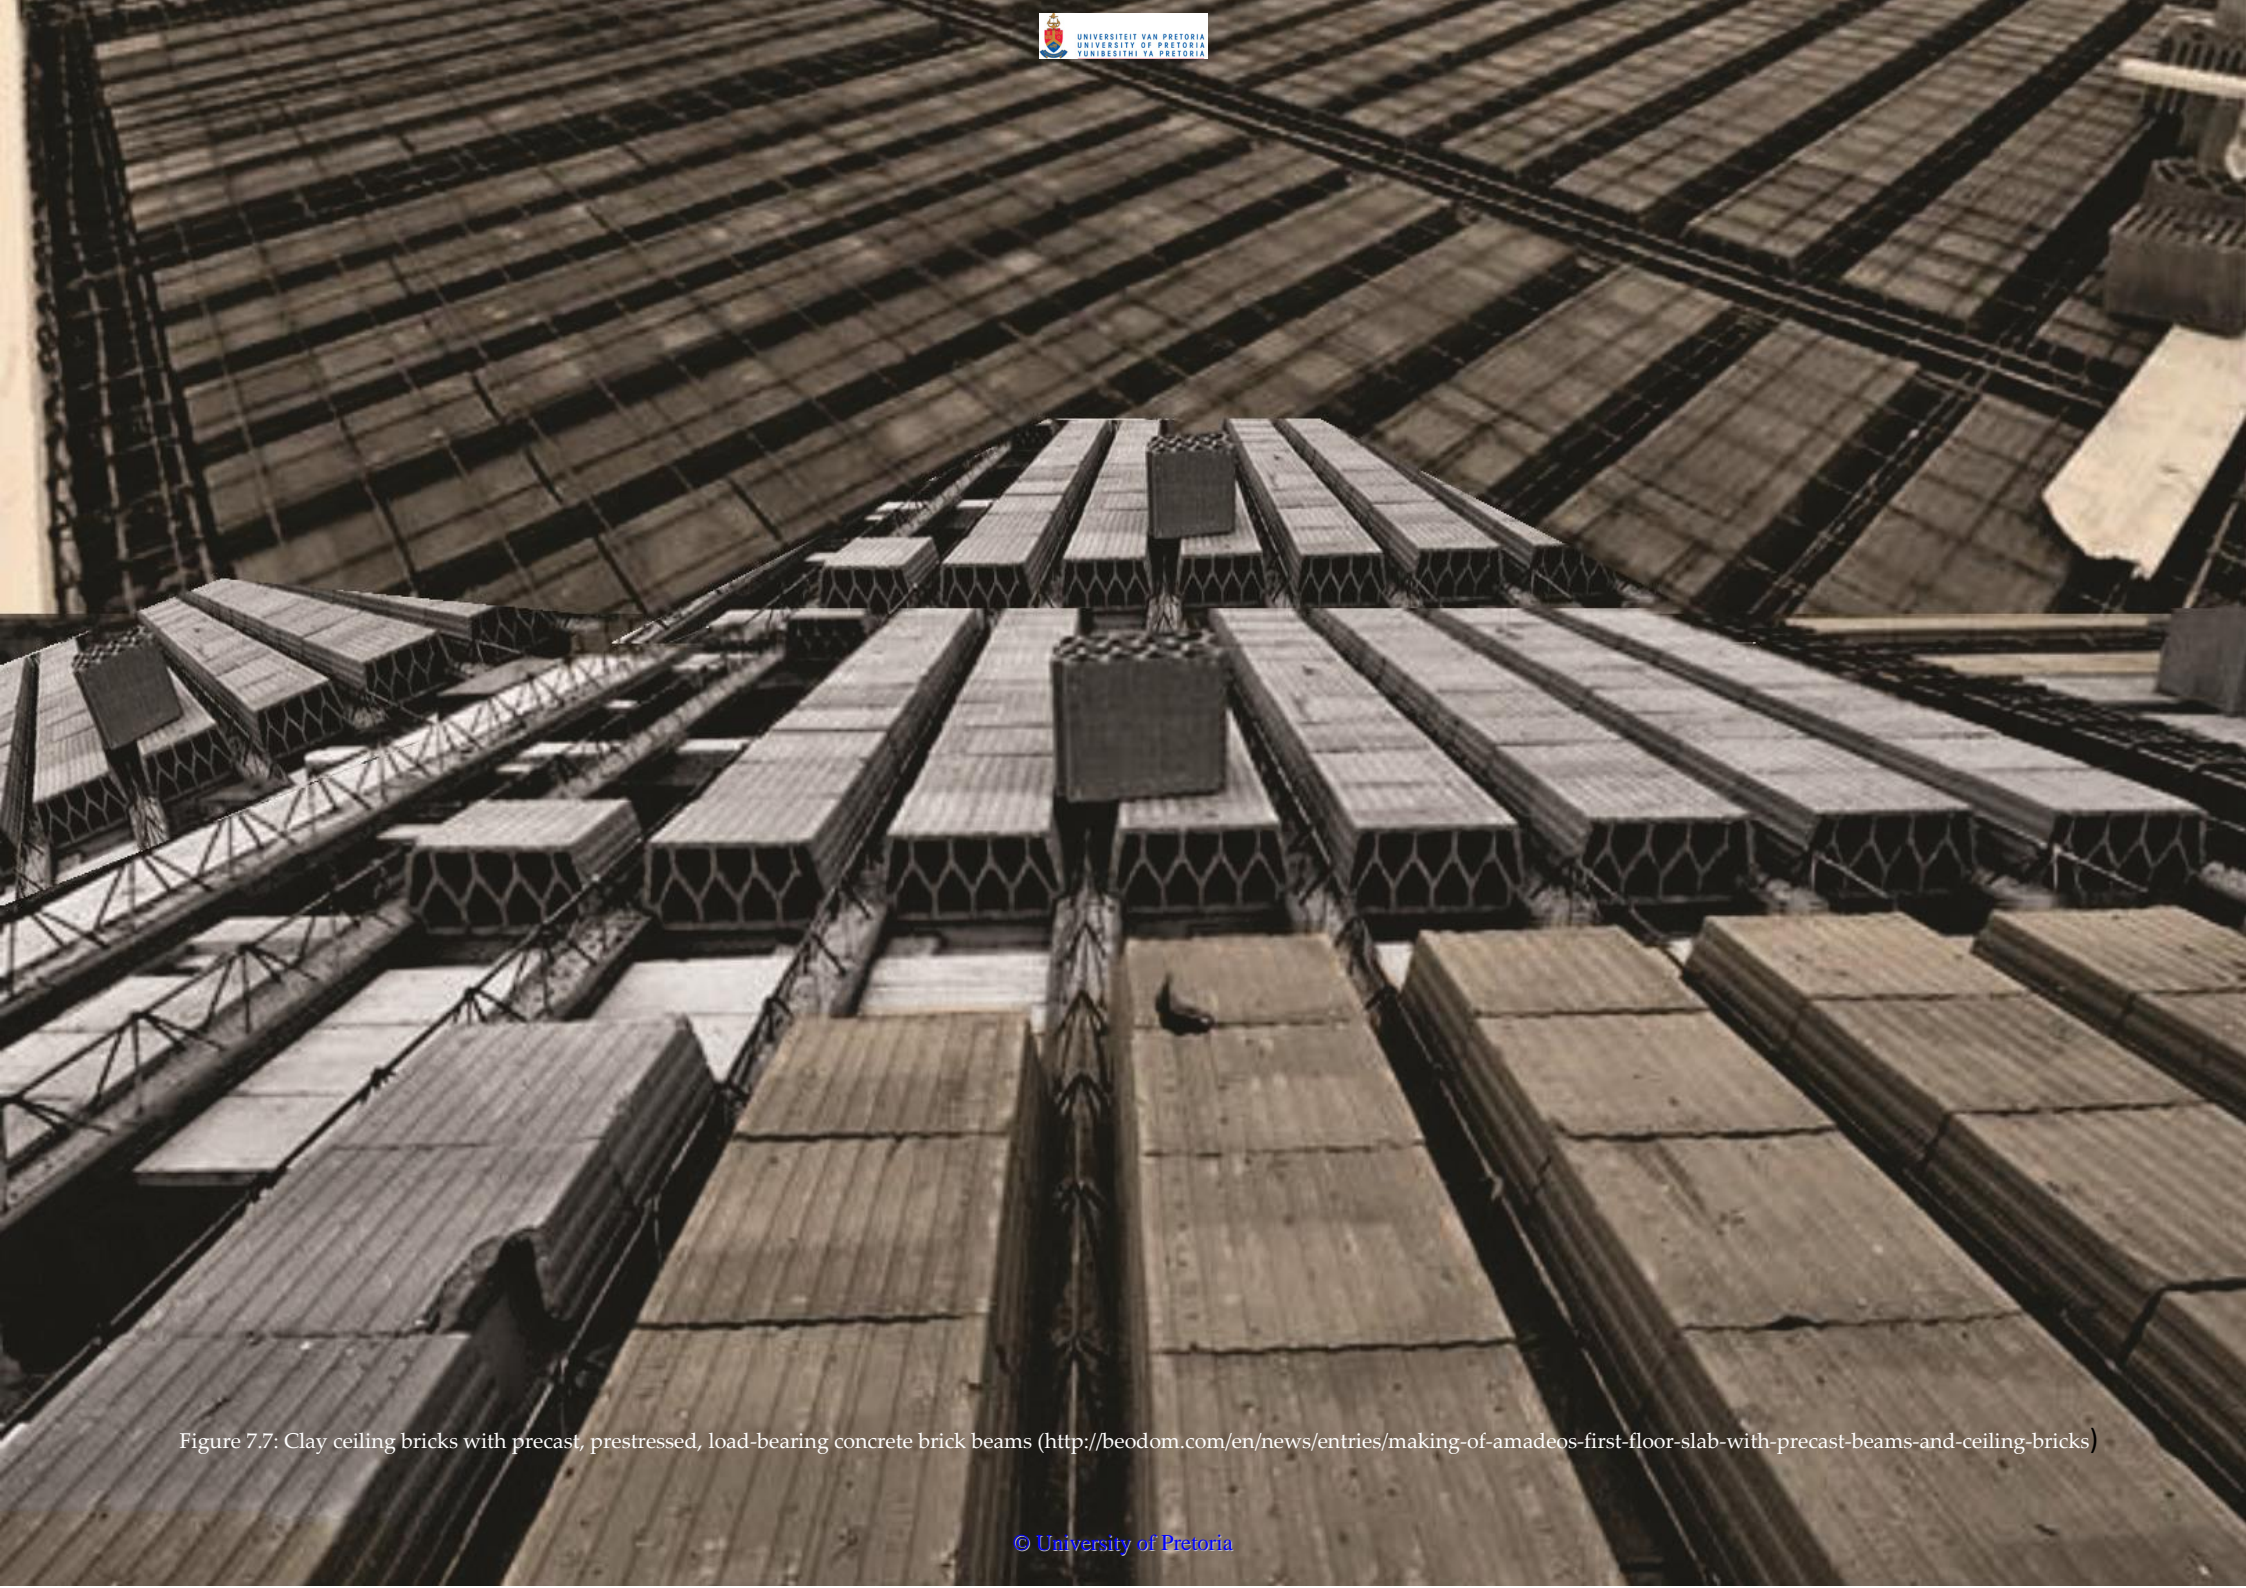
Clay ceiling bricks with precast, prestressed, load-bearing concrete brick beams (<http://beodom.com/en/news/entries/making-of-amadeos-first-floor-slab-with-precast-beams-and-ceiling-bricks>)
